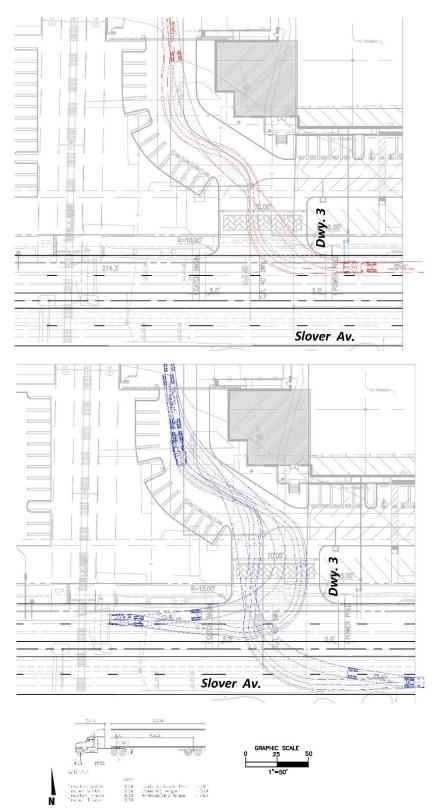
TRUCK ACCESS AT DRIVEWAY 3
